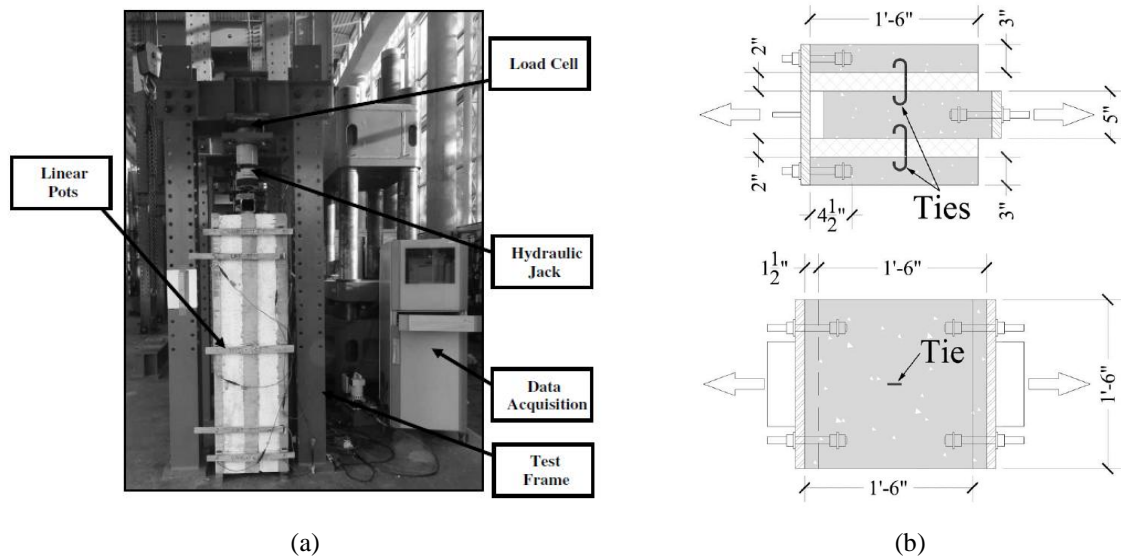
Test configurations to assess the direct shear behaviour of connectors for concrete sandwich panels.
